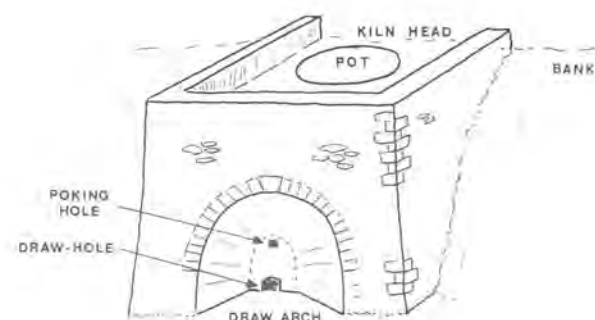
shows the features of a 'typical' Dorset draw kiln, built into a bank with protective wall around the top or kiln head. Construction was of stone, with thick insulating walls. The shape of the brick-lined pot (charging hole, well or burning cone) was like an inverted bottle, round with vertical sides tapering towards the base where there was an iron grate or grill. The main feature was a single draw arch (access arch) in the front wall. It opened into a recess or lobby which narrowed towards the back wall where the draw-hole (eye) provided the draught to the kiln and the means for drawing out the burnt lime. Above the draw-hole, poking holes were small square openings through which an iron rod (bar) was inserted to test the extent of burning and loosen the charge should it become stuck.
